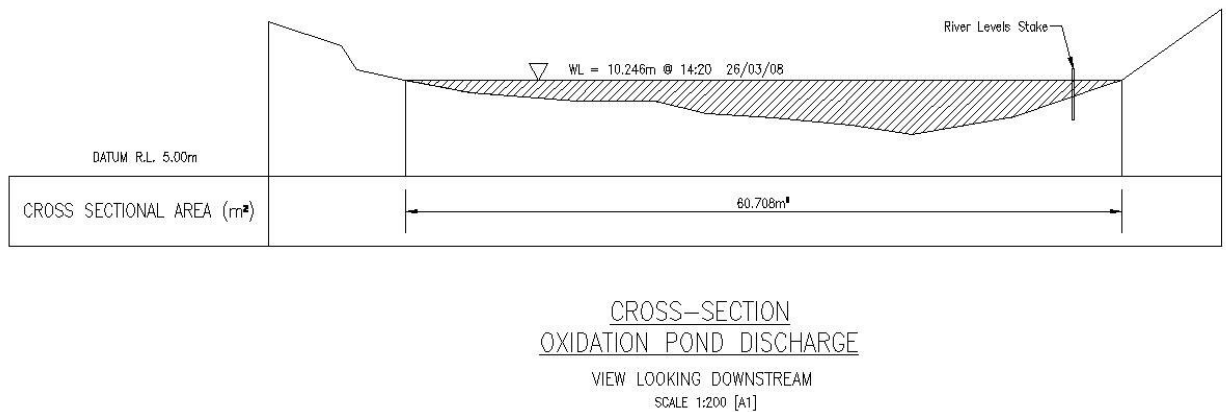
Cross-section at point of discharge (not to scale) - note additional cross sections are in Appendix A.
